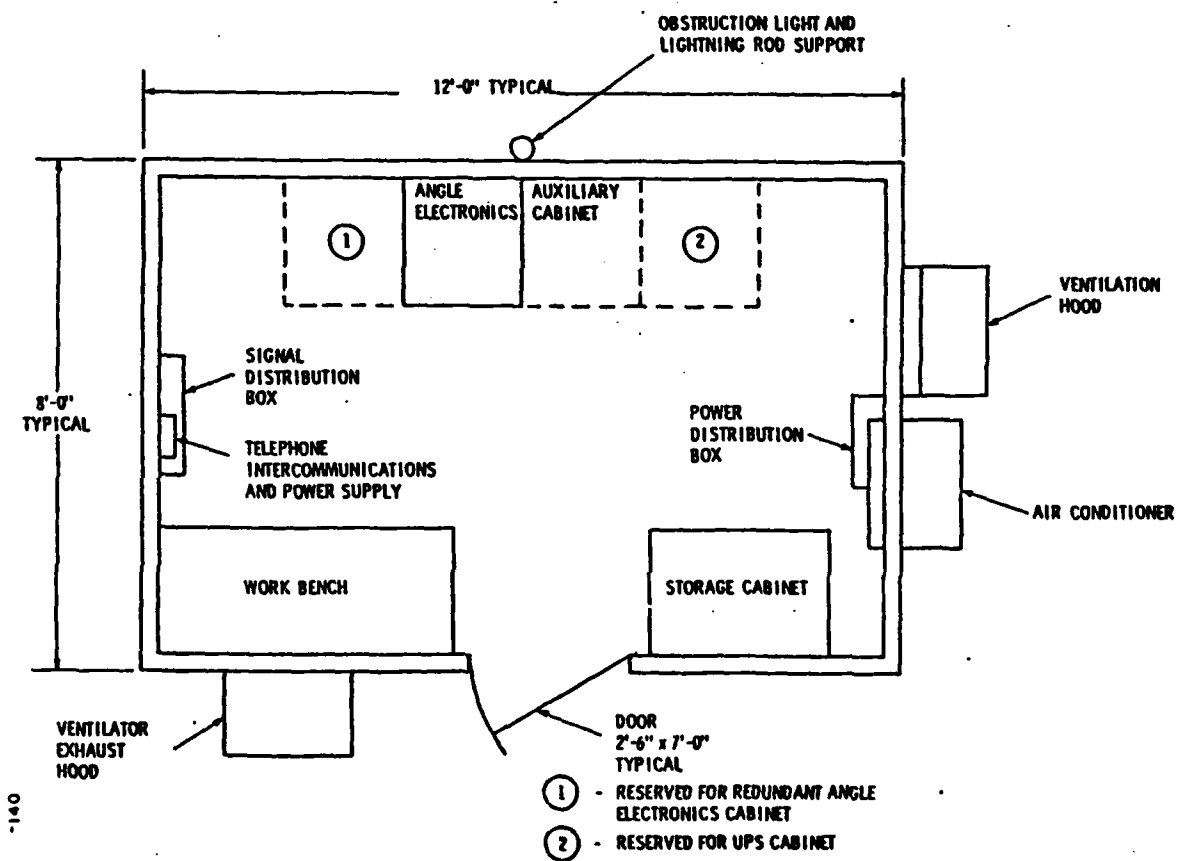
ELEVATION EQUIPMENT SHELTER, PLAN VIEW
